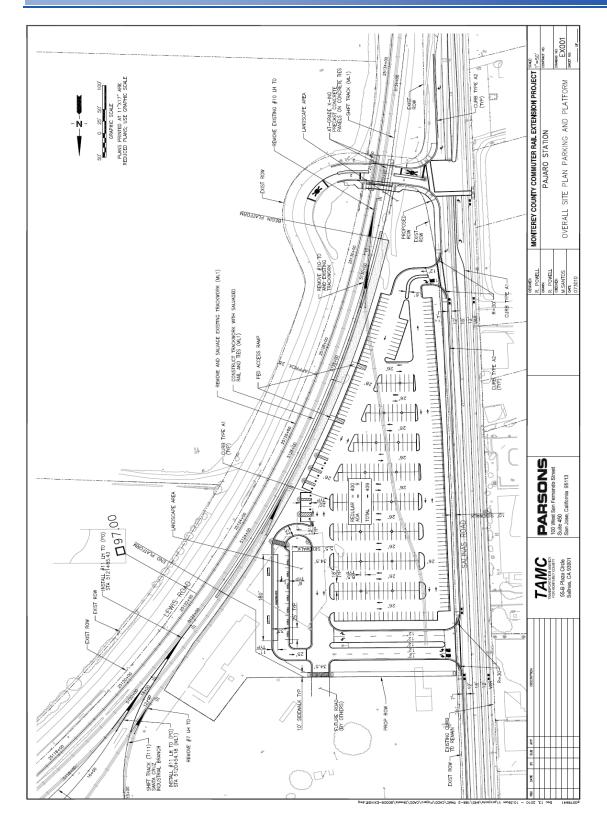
Pajaro/Watsonville Station - Preliminary Design Layout
